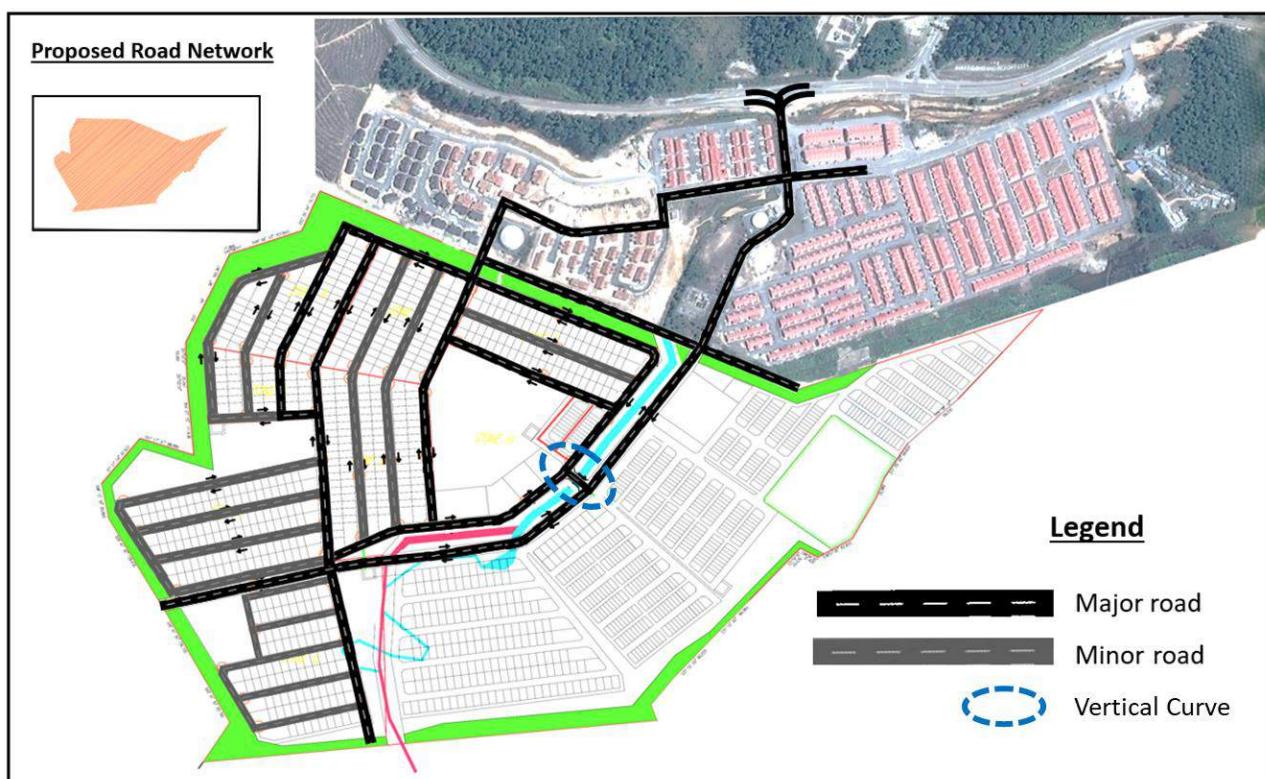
Proposed Layout of Road Network with location of Vertical alignment
